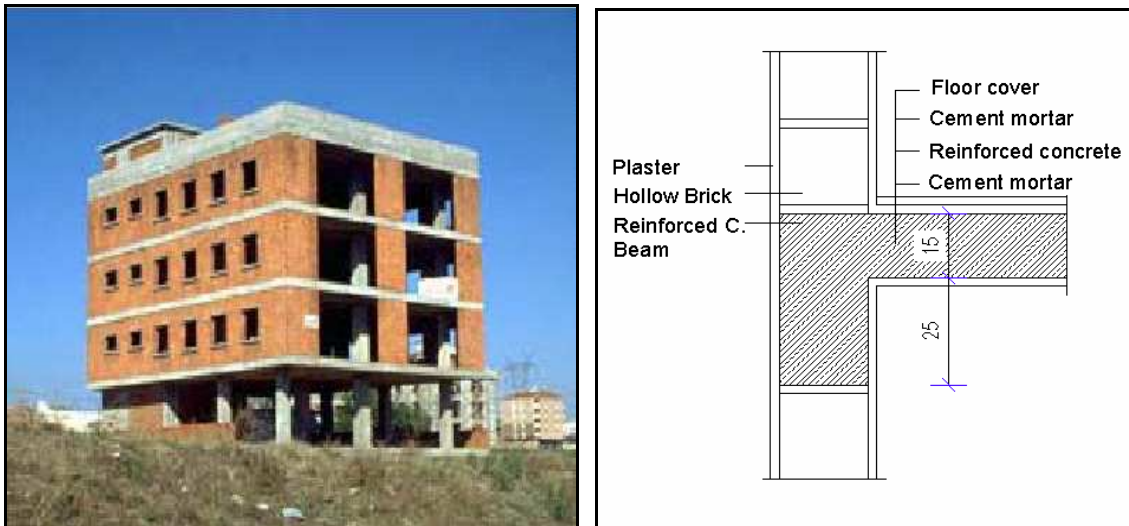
Typical reinforced concrete system in Turkey without plasters.
